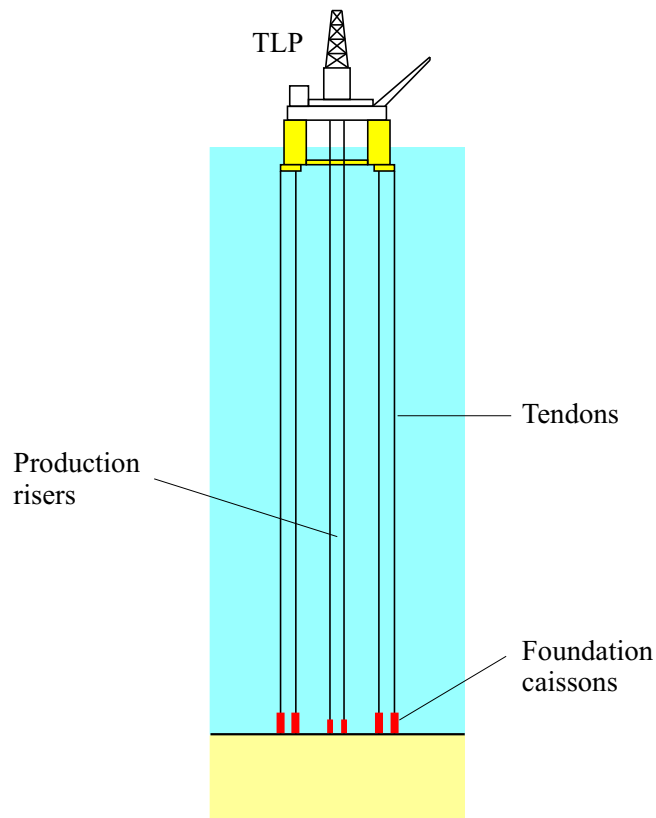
Caissons used as foundations for a Tension Leg Platform (TLP).
